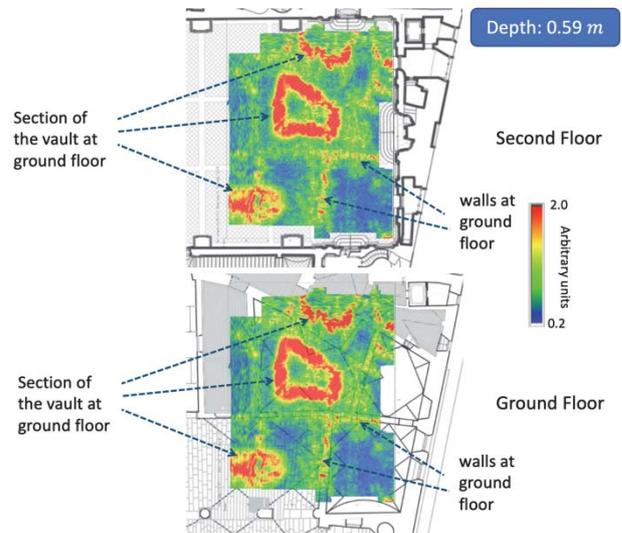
C-scan at 0.59 m superimposed to the maps of the second floor and the ground floor
